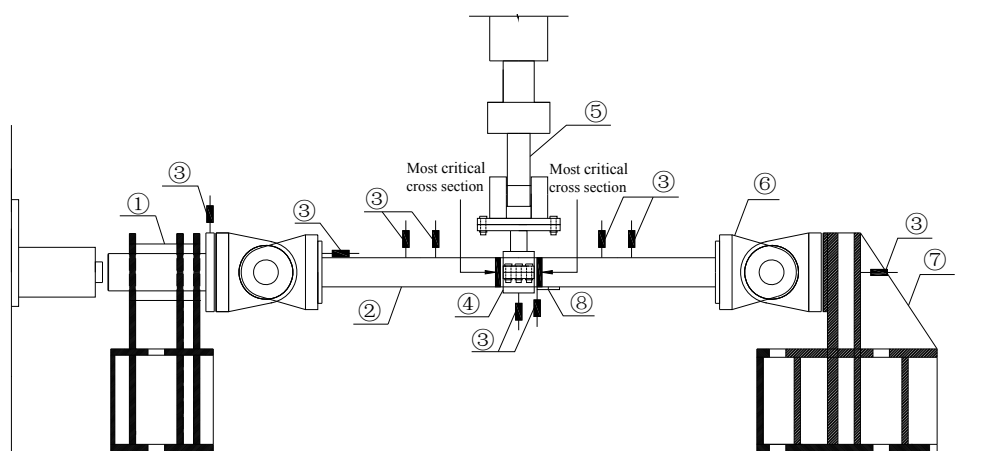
Experimental setup: (① Front fixture support; ② Specimen; ③ Displacement meter; ④ Rigid fixture; ⑤ MTS actuator; ⑥ Pin support; ⑦ Posterior fixture support; ⑧ Curvimeter).
